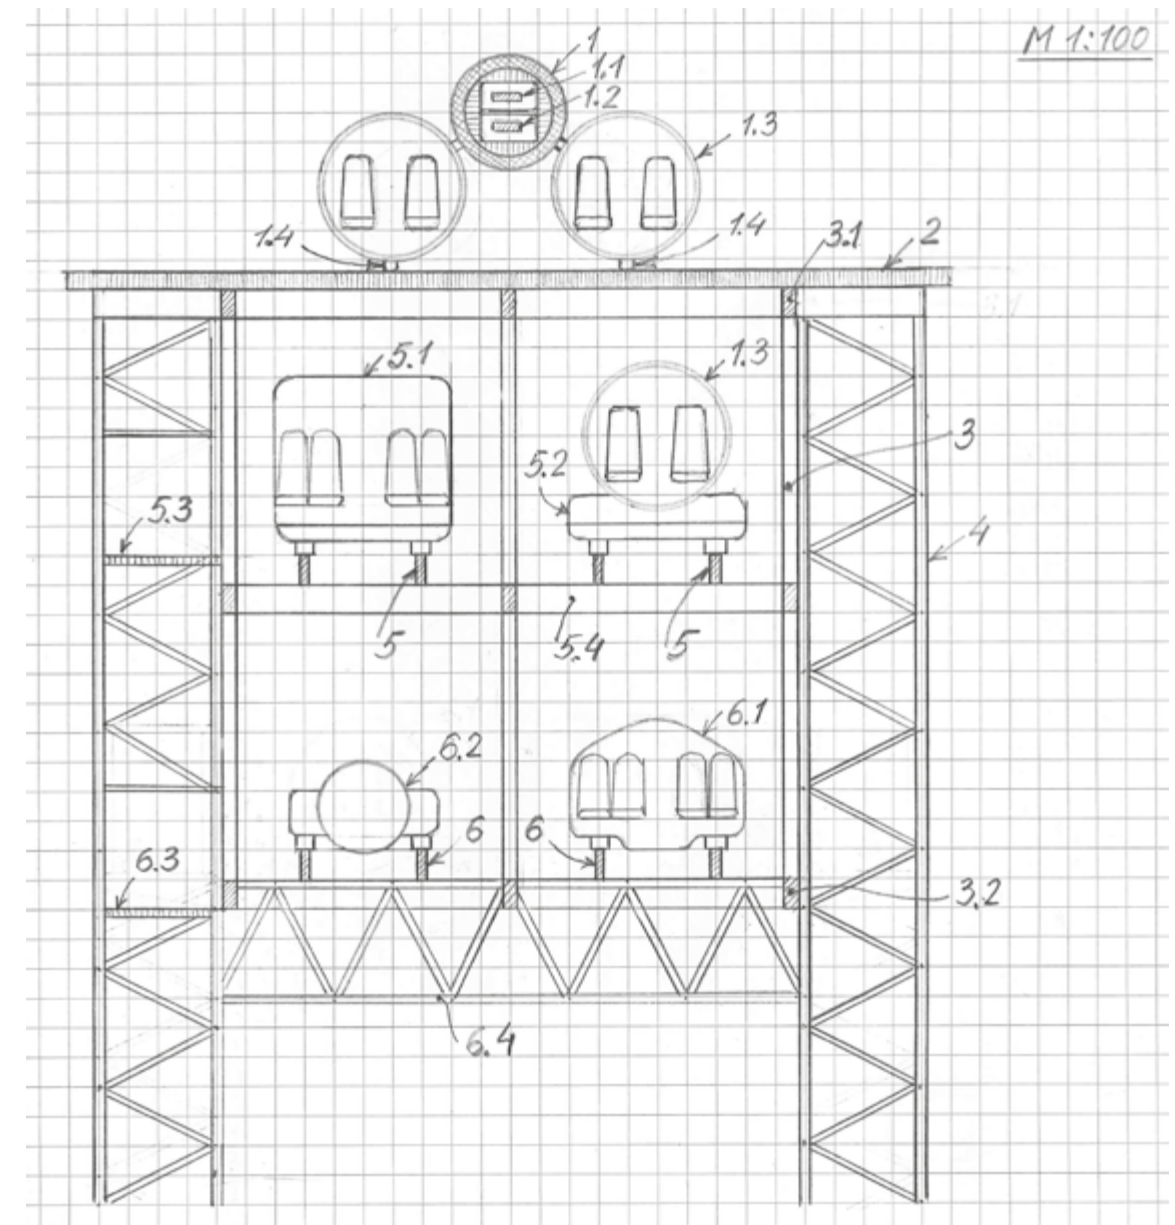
Cross section of the upper structure of the GPV takeoff and landing overpass:
